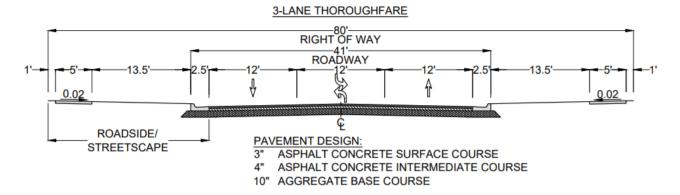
Town of Apex Street Typical Section 3-Lane Thoroughfare
